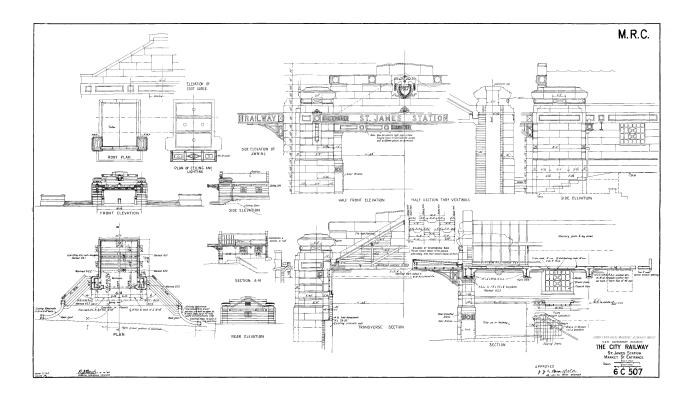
Original architectural drawing of the entrance to St James Station on Elizabeth Street dated 10/12/1926 showing awning structure consisting of steel cantilever beams supporting timber framed roof and roof sheeting, with decorative copper fascia and decorative steel support brackets. Although not noted on this entry drawing, the original drawing for the entry on St James Road indicated the roofing material was galvanised iron and had a 5lb lead box gutter (Figure 7). (Source: Sydney Trains Archives)
